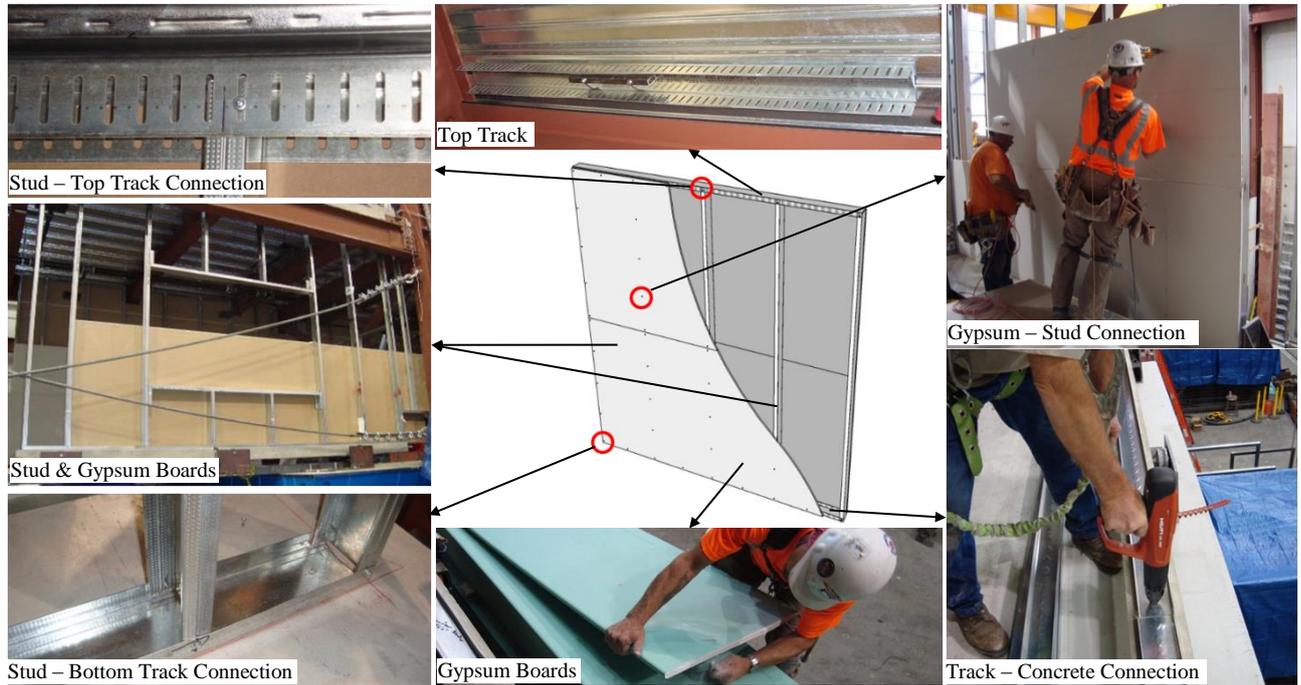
Typical layout and elements of a light-gauge steel-frame gypsum partition walls.
